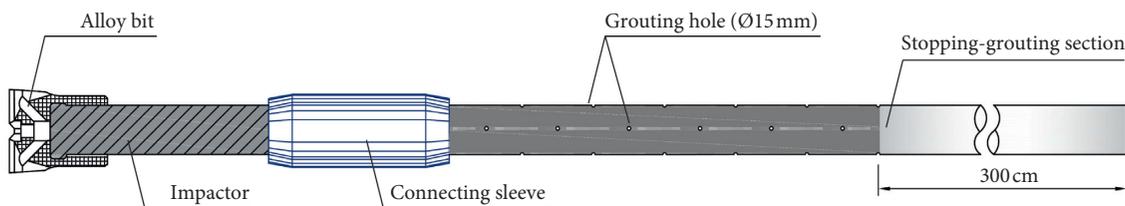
Structure of self-propelled hollow grouting pipe shed.
